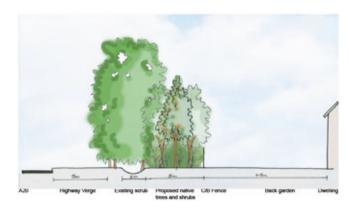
Sketch section of landscape buffer planting along north boundary of site
